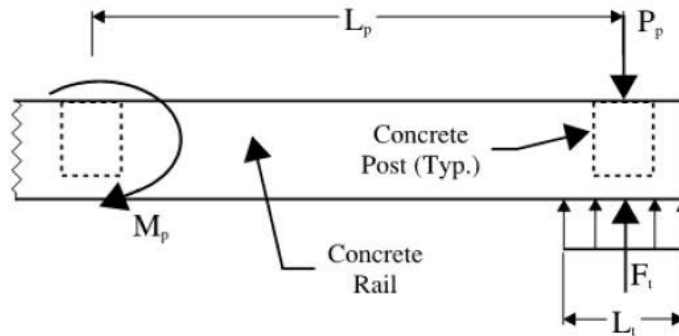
Single-Span Failure Mode for Post-and-Beam Railings at an End Section or Joint
